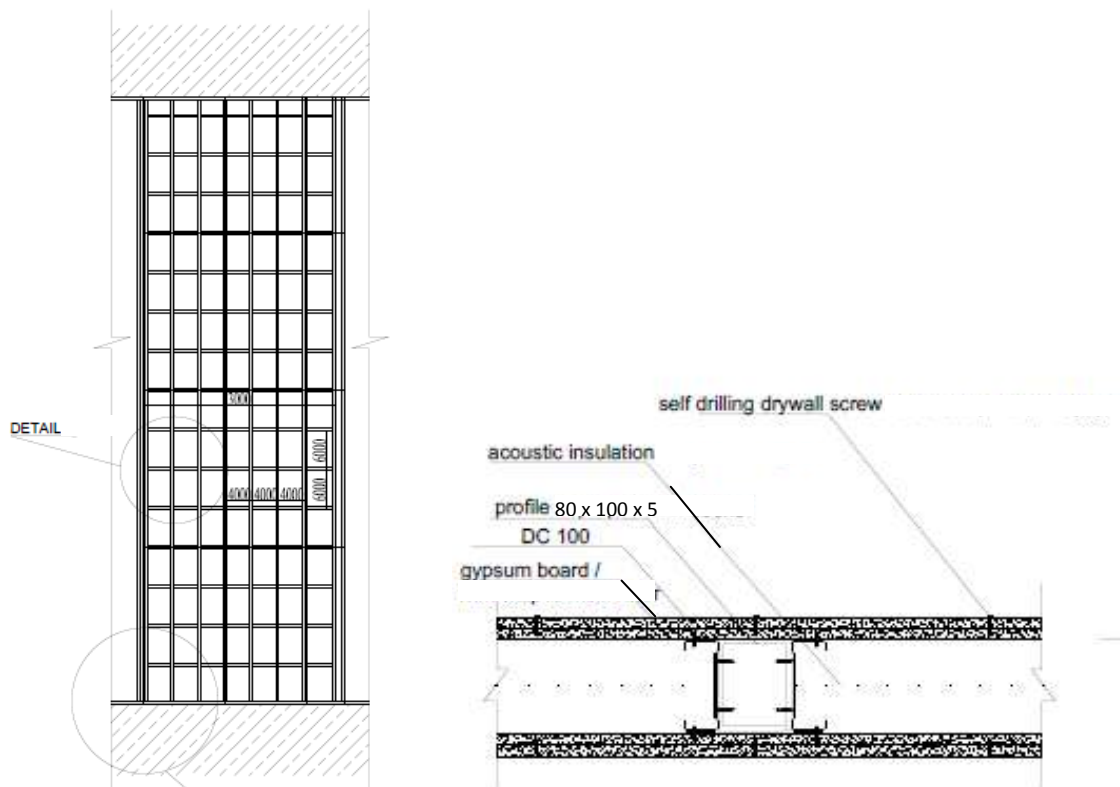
Diagram and cross-section of internal façade (atrium) of gypsum board.
